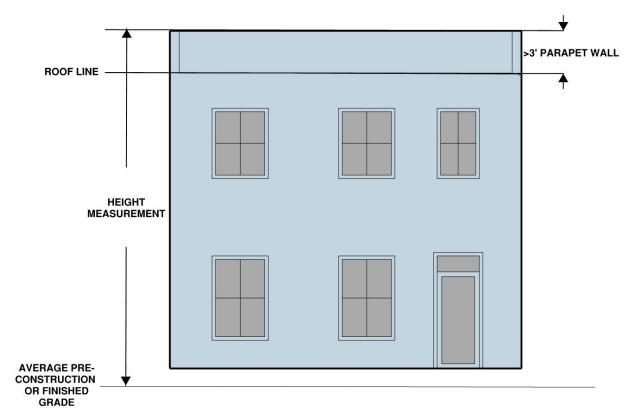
flat roof: Height is measured to top of parapet wall because it exceeds 3 feet in height.
